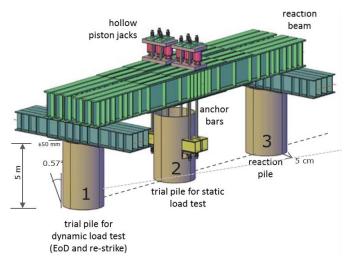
Schematic of Wikinger static testing arrangements; after Jardine (2020).
